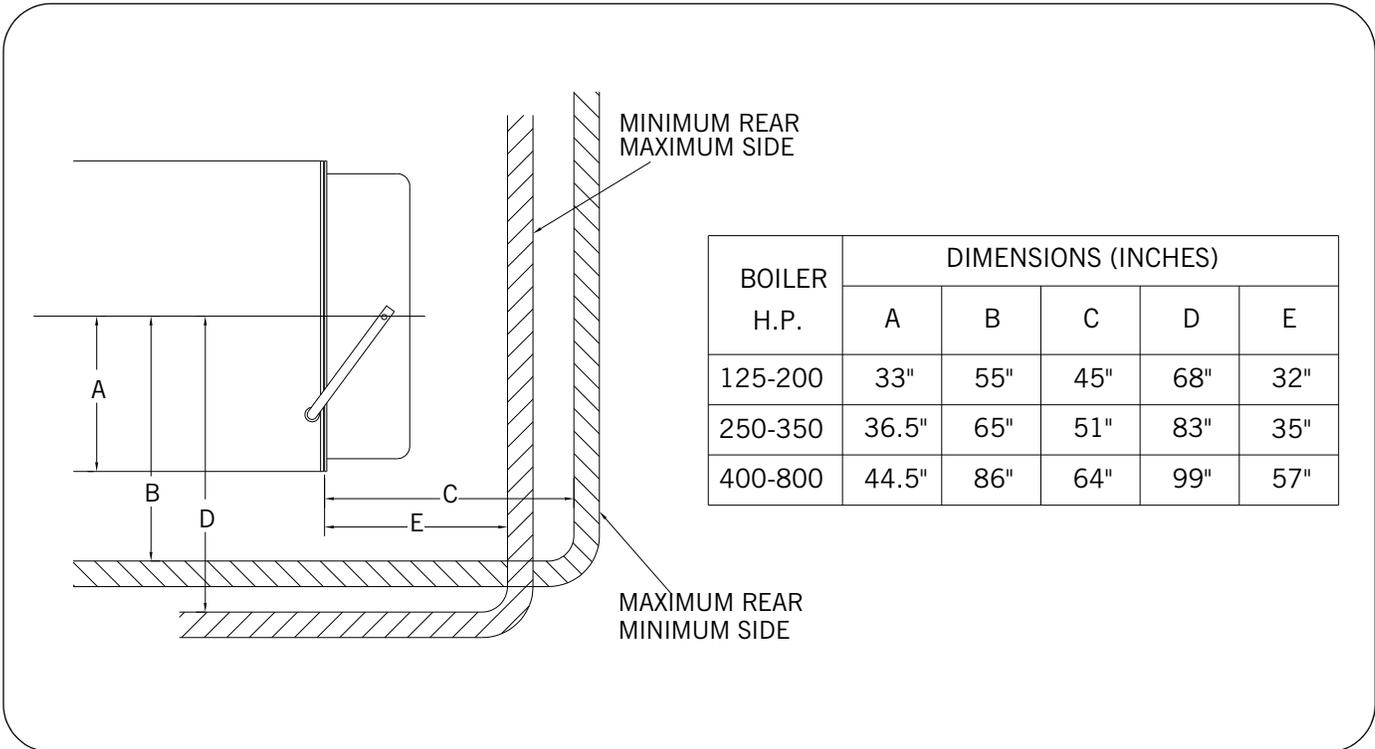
Space Required to Open Rear Head on Model CBR Boilers Equipped with Davits
